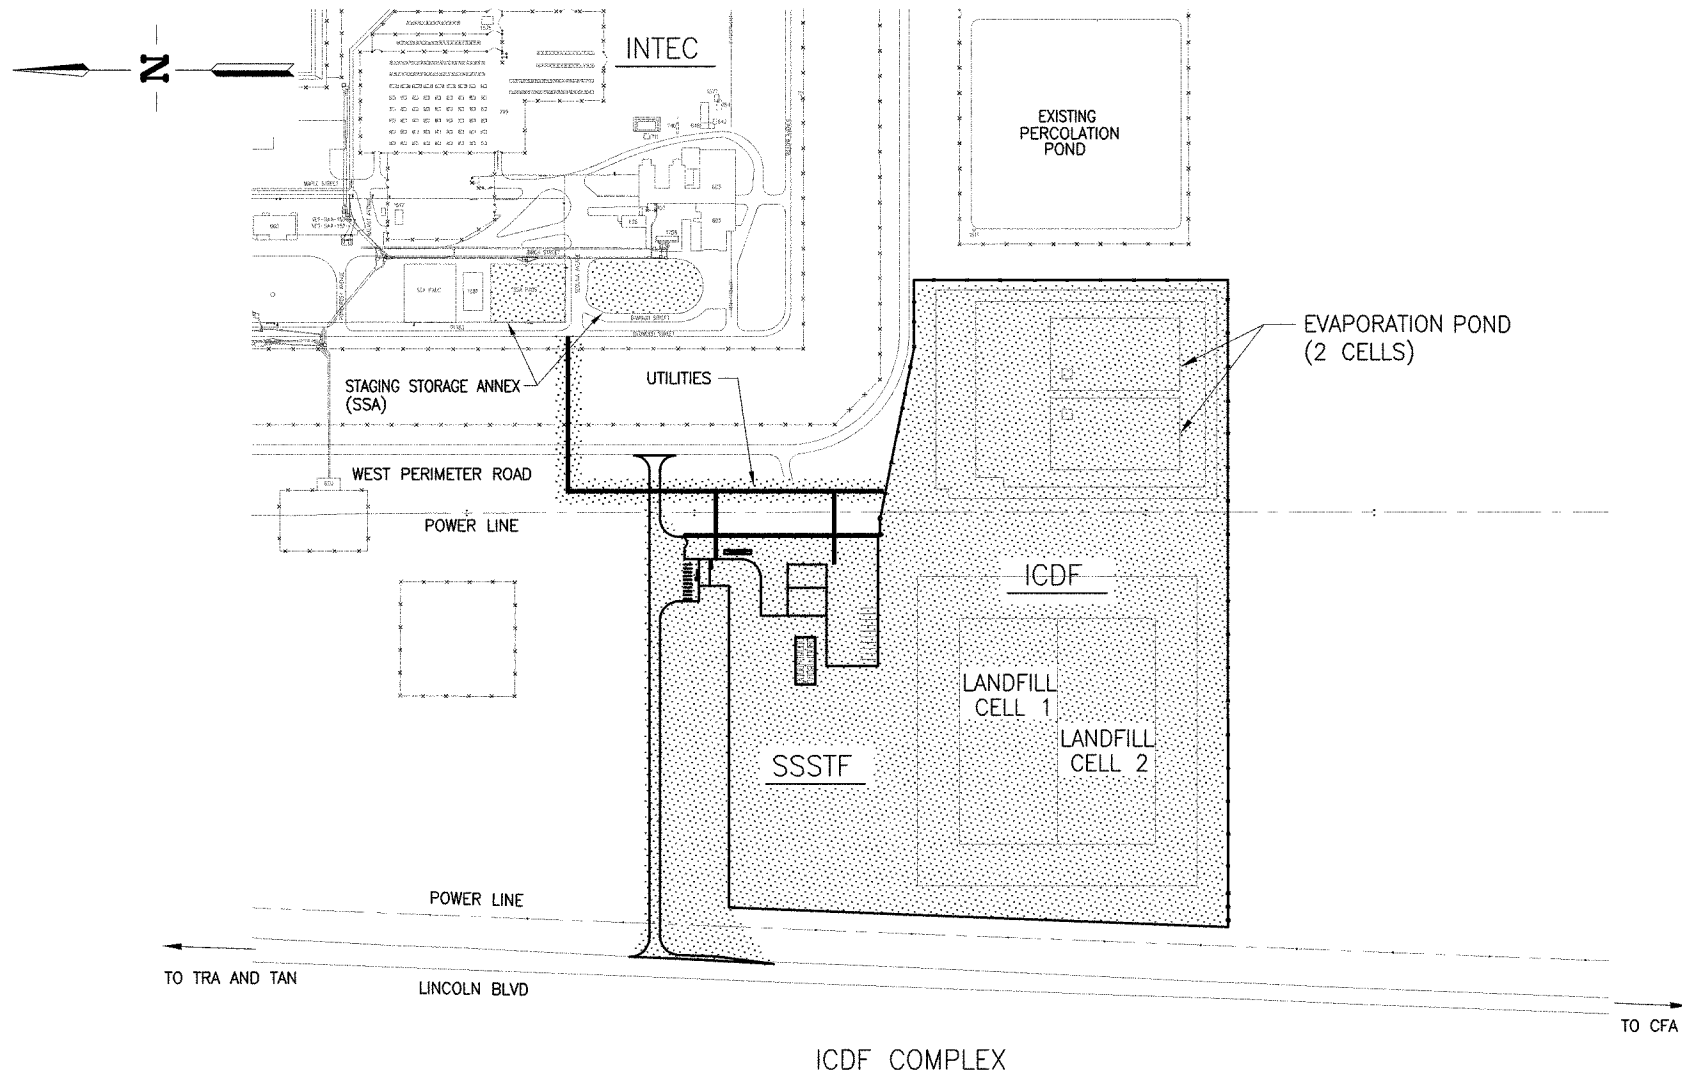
Location and plan-view layout of the ICDF Complex.
